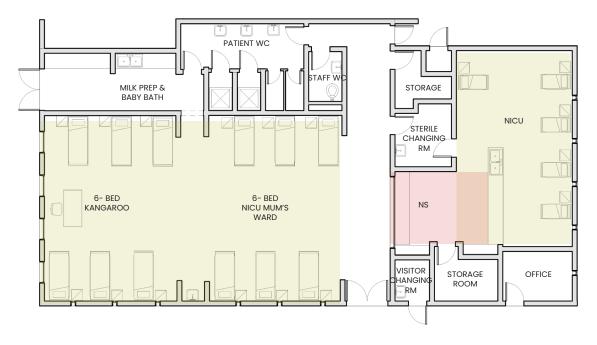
FLOOR PLAN OF MATERNITY BLOCK
